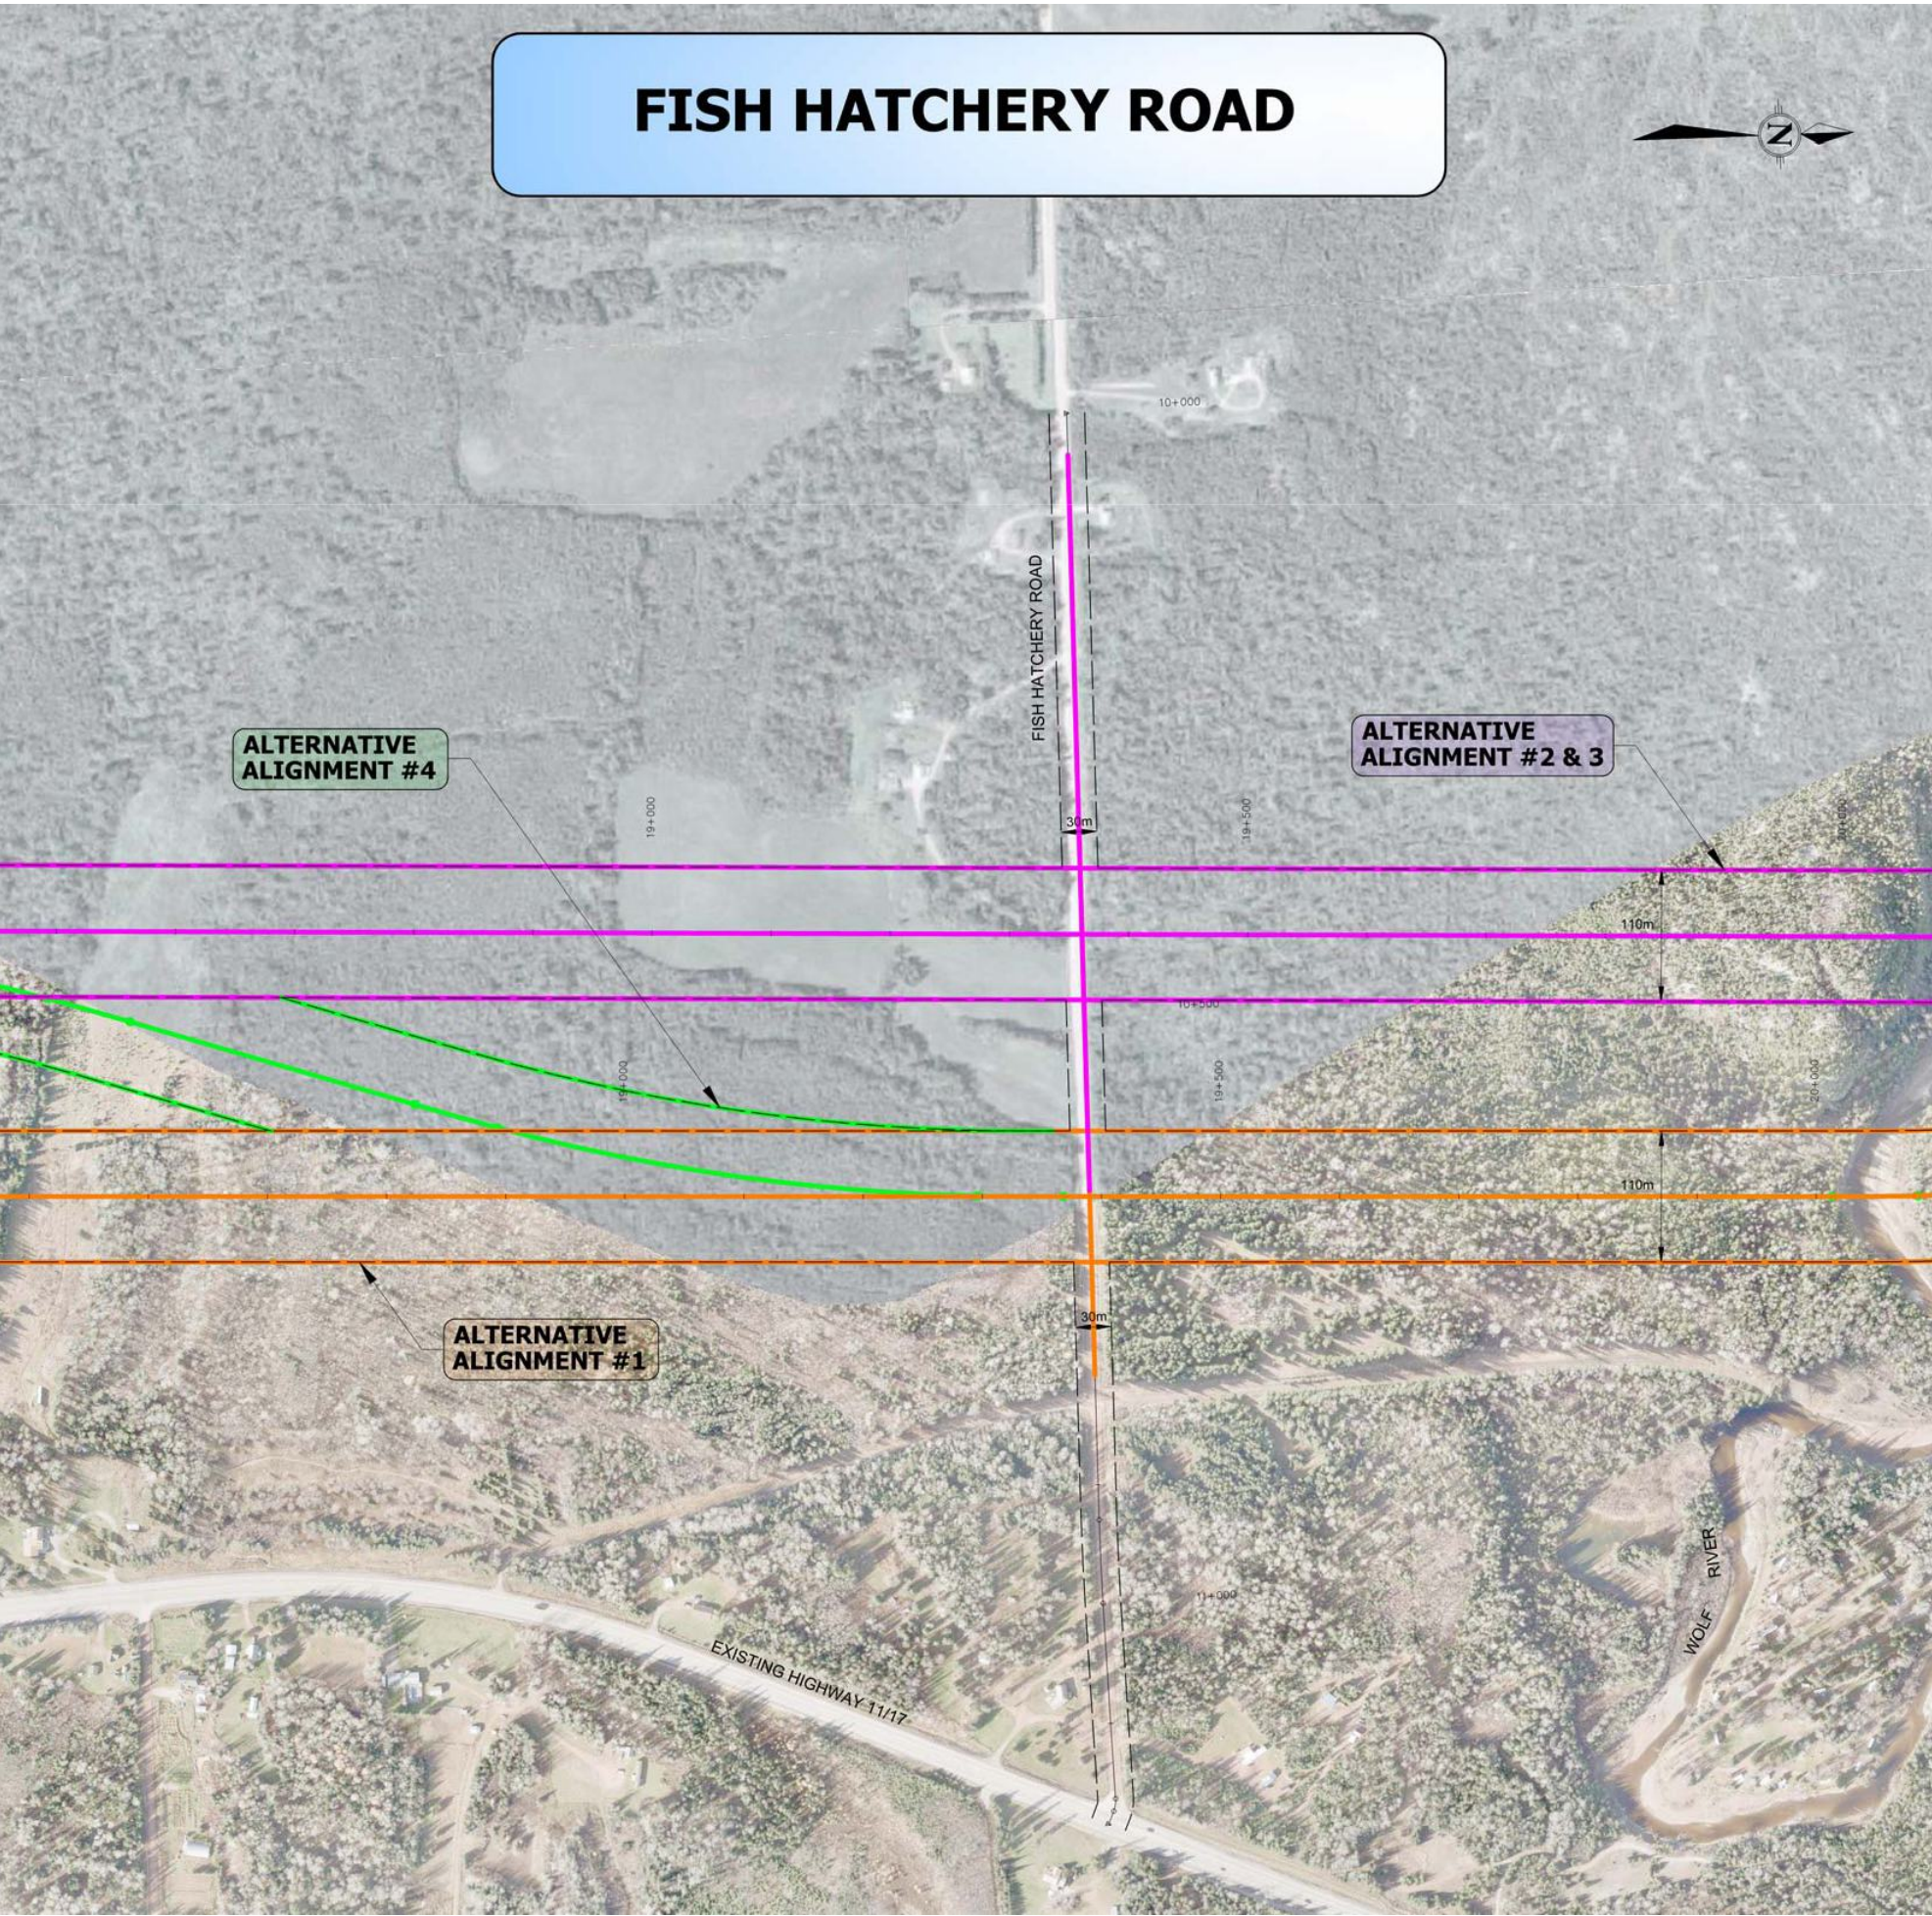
to 4-12 depicts the six (6) public access locations that were reviewed.
